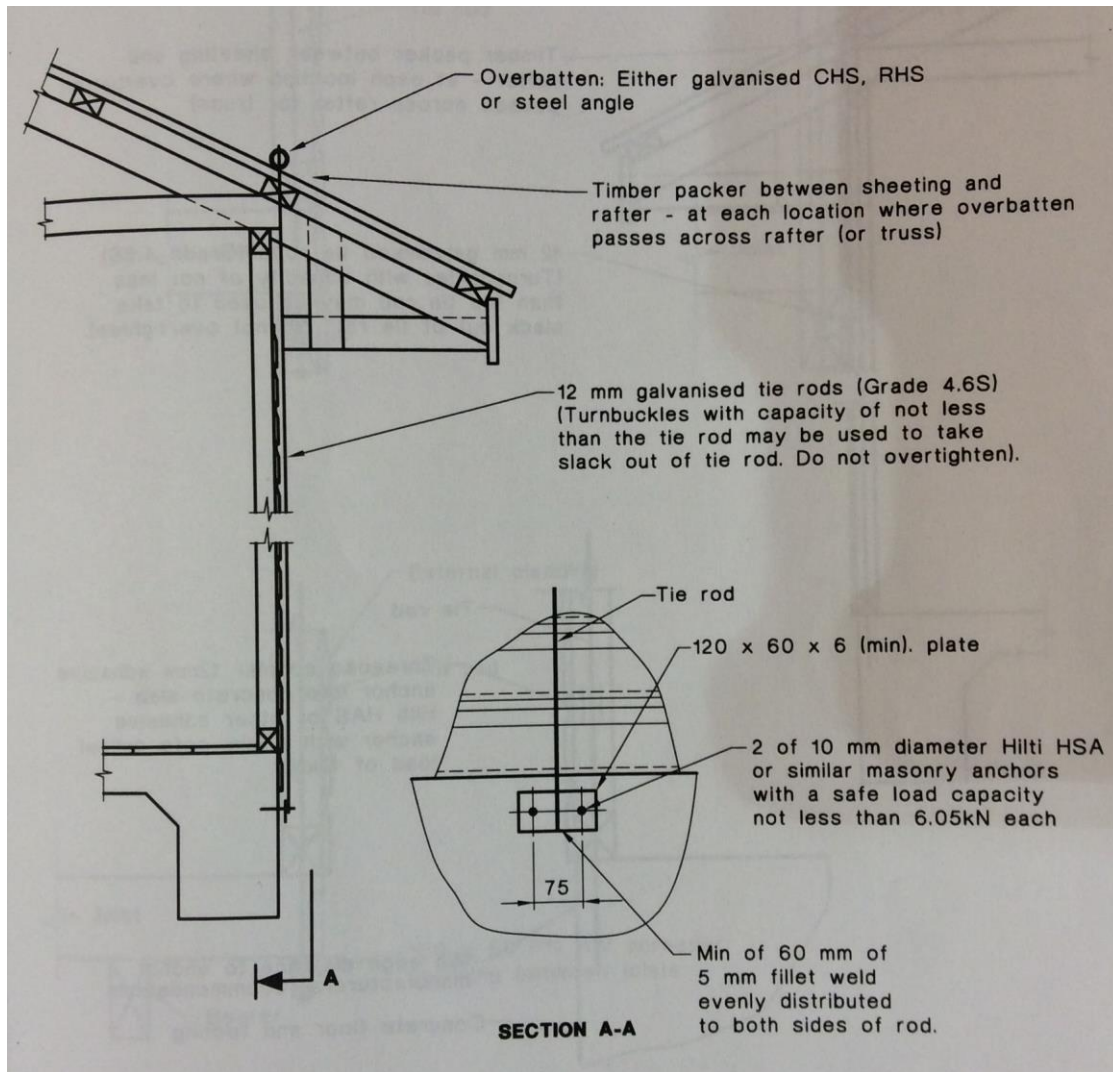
Drawing from Australian Standard's Handbook HB132.2 and Typical over-batten installation per HB132.2 Structural Upgrading of Older Houses
